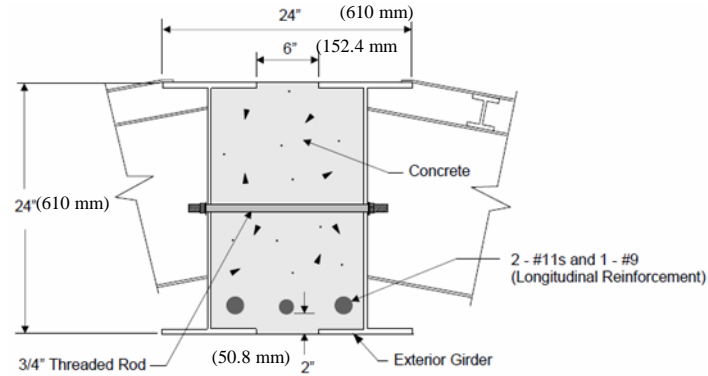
Longitudinal connection beam at the centre connecting two wagons
